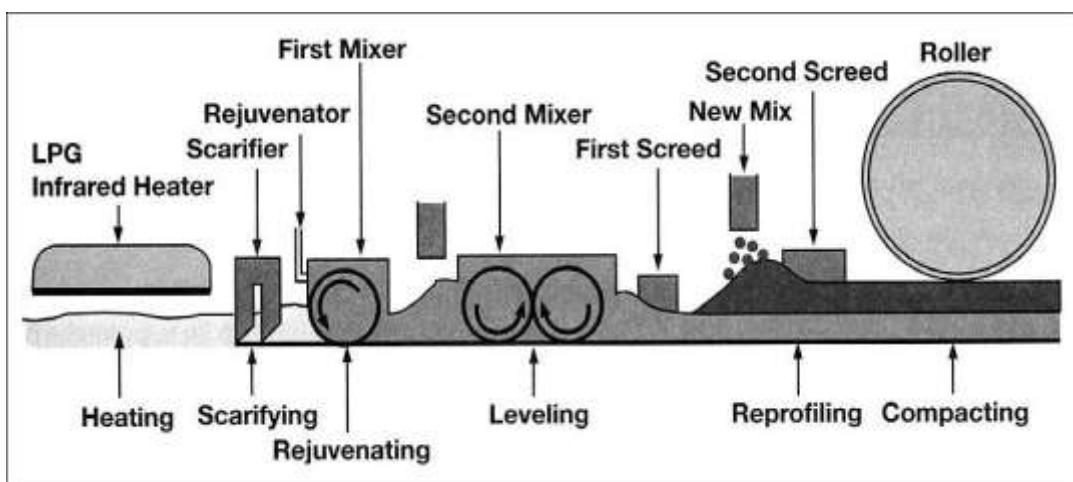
Hot in-place repaving process and equipment, (Santucci, 2007).
